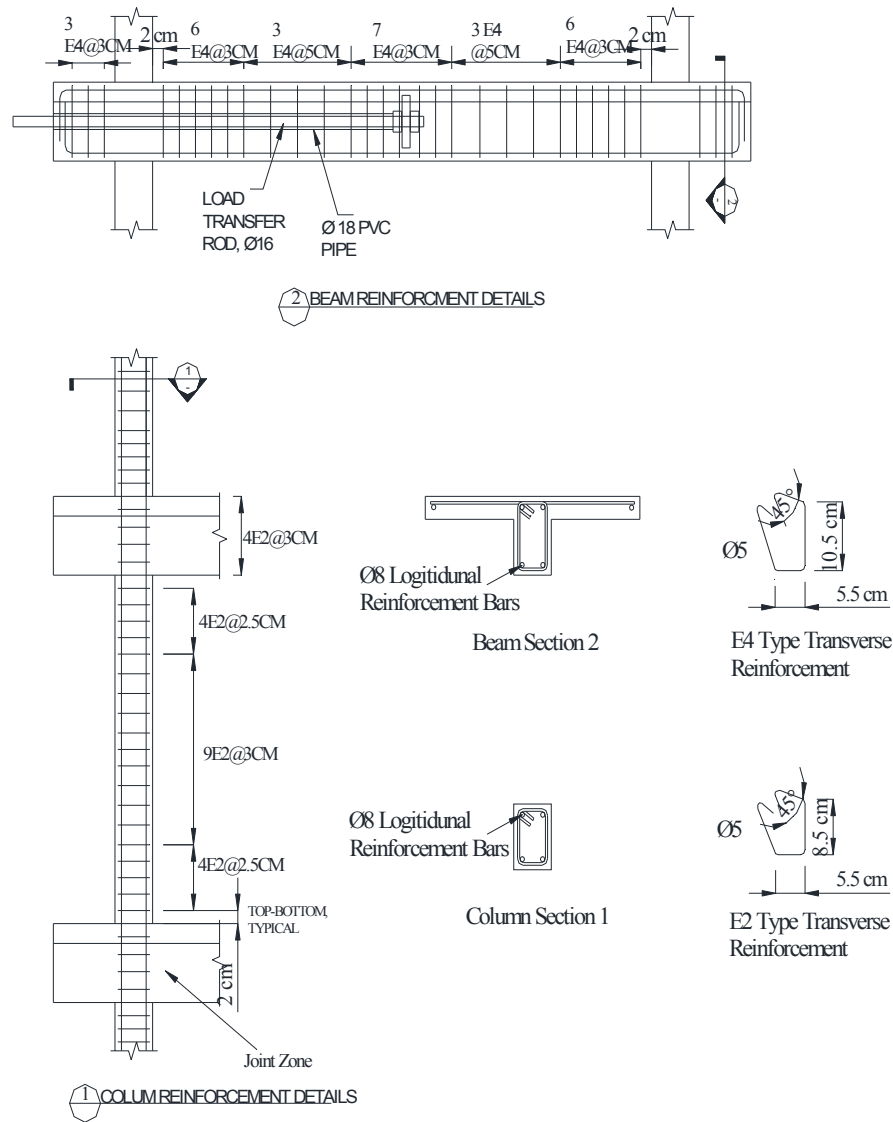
Reinforcement details of the frames with brittle reinforcement
